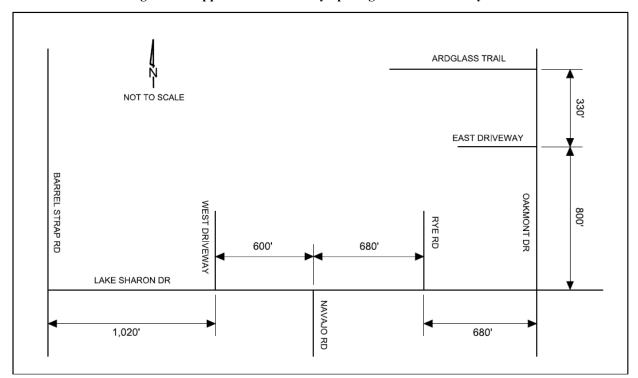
Approximate Driveway Spacing for Avilla Fairways Site
